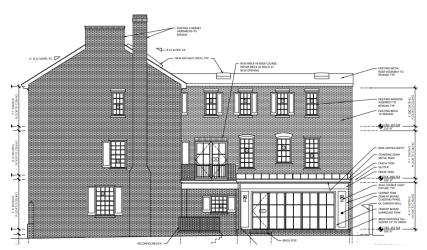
Architectural plan of proposed one-story addition, as viewed from the east.
